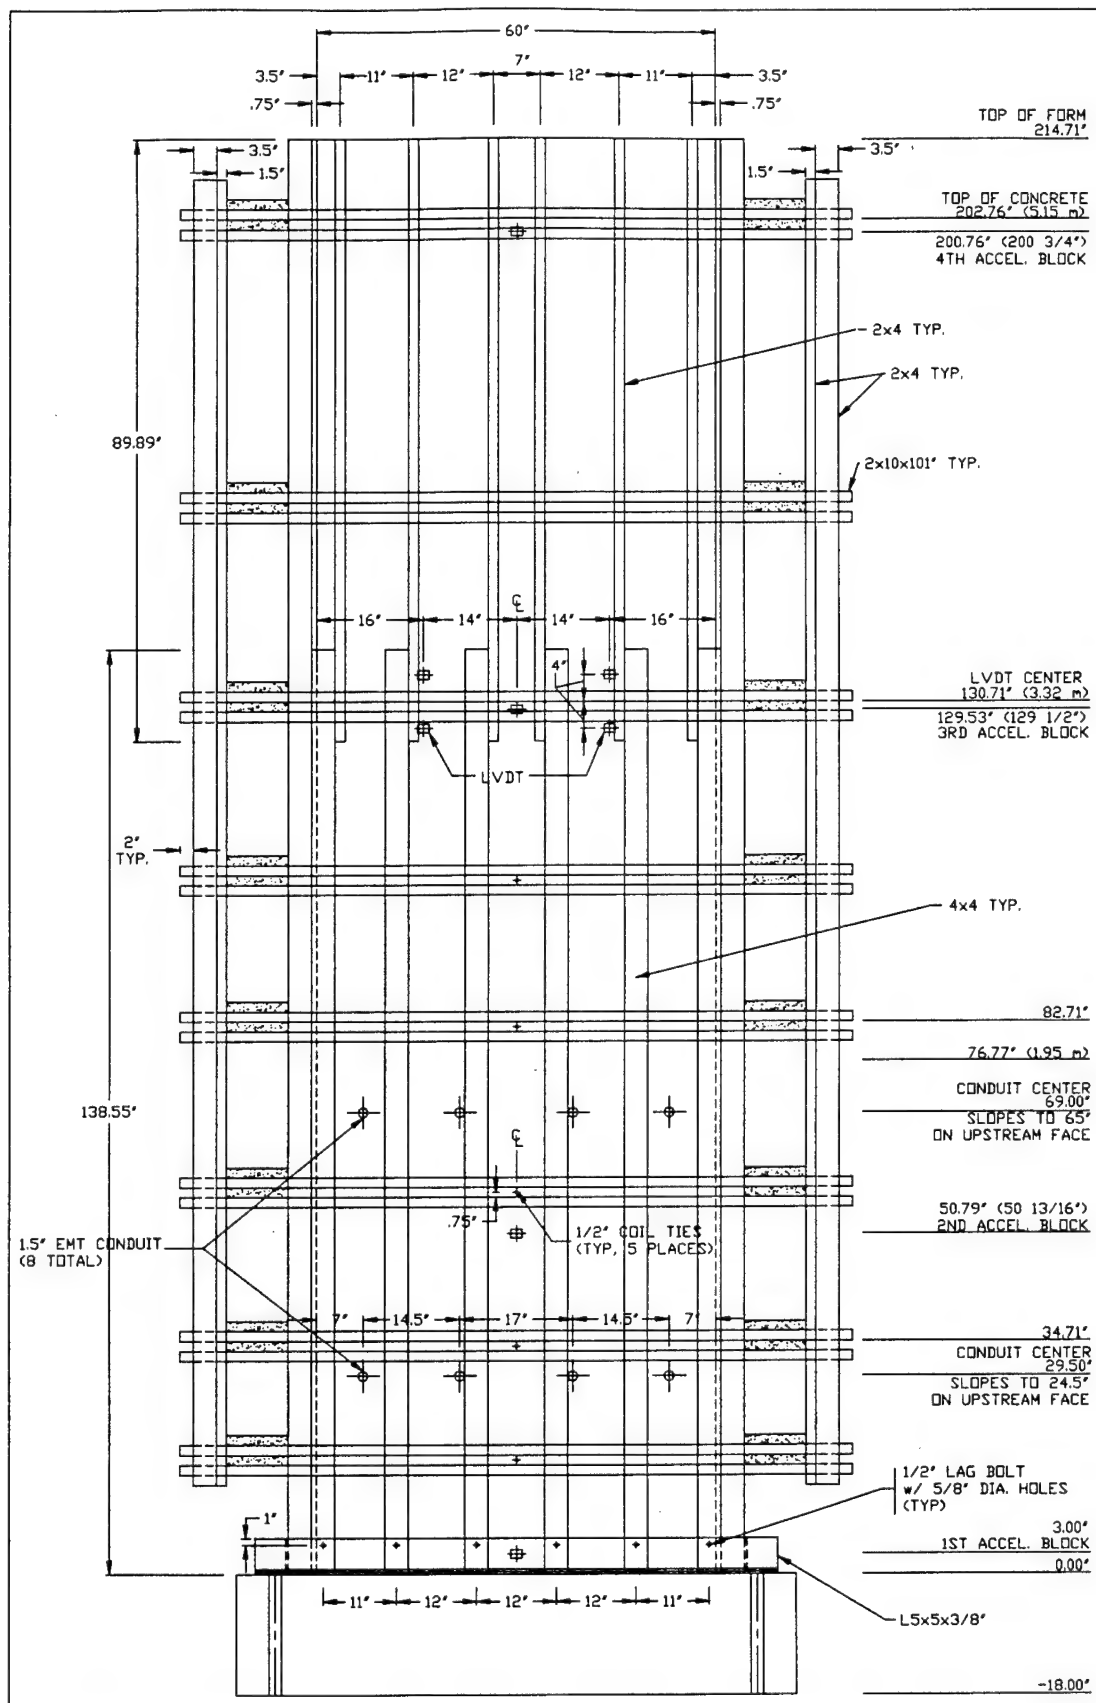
Downstream face formwork showing the walers, corners, and the location of ties, EMT conduit, and instrumentation plates.
